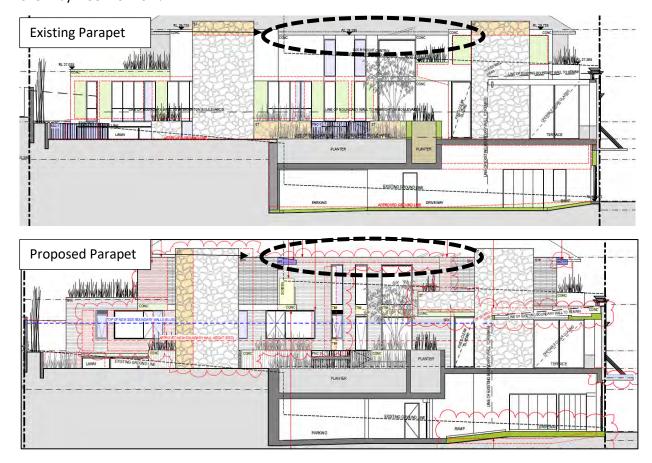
Location of increased parapet height that will match the existing parapet to the front and rear of the building. (*Source: MHNDUNION, 2021*)
